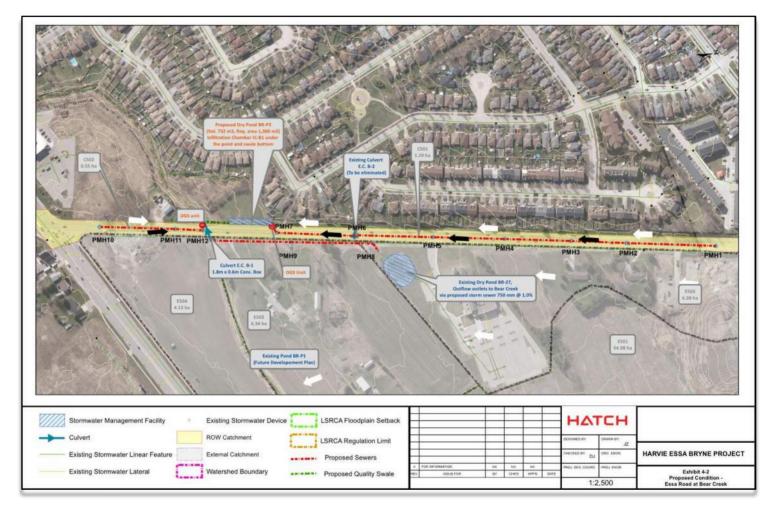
Proposed Drainage Concept – Essa Road at Bear Creek
